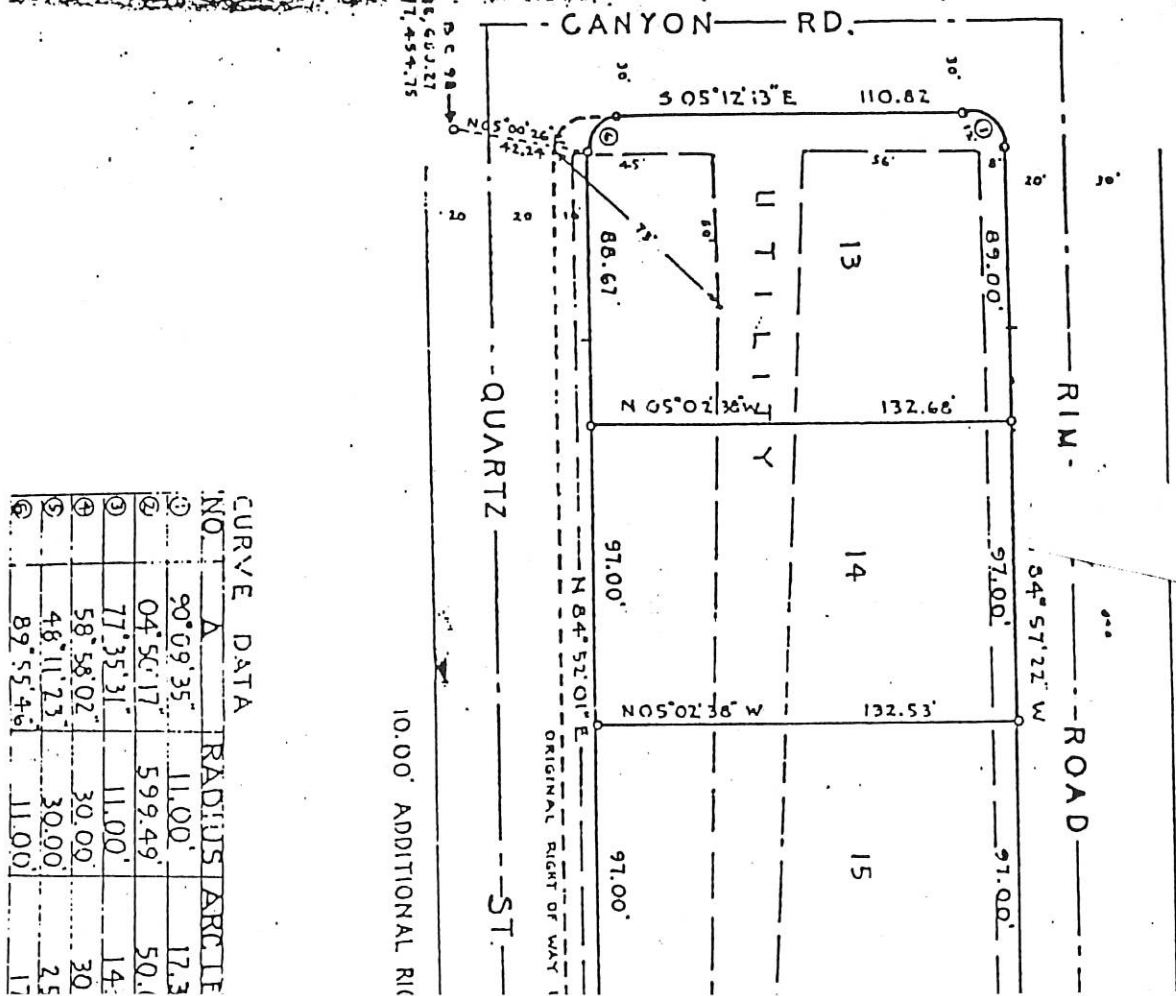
Application, Lot Survey and Proposed Floor Plan
